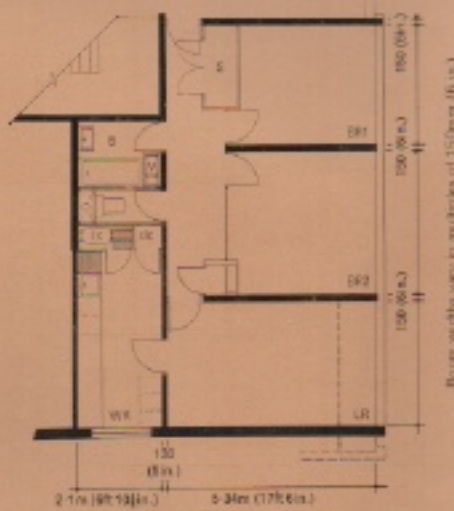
Plan extended to give larger rooms and a balcony to the living room.
